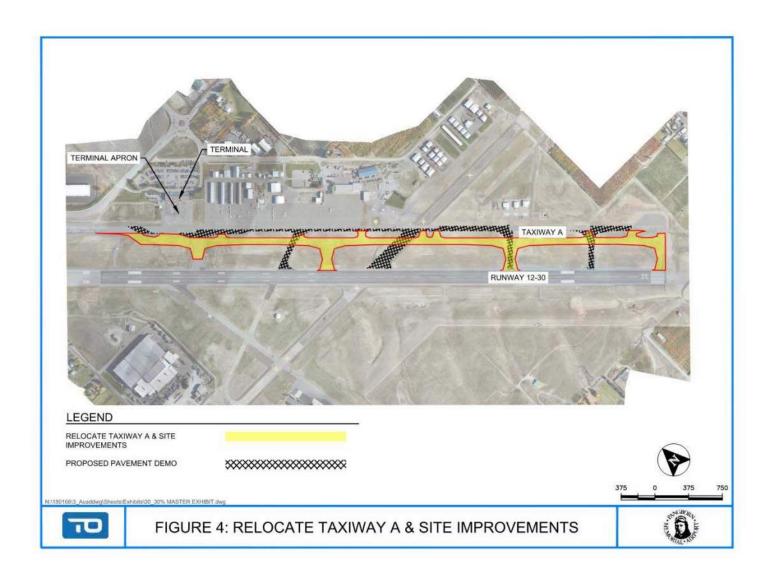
Relocate Taxiway A and Site Improvements, adapted from Proposed Improvements Exhibit, (dated 1/29/21)
